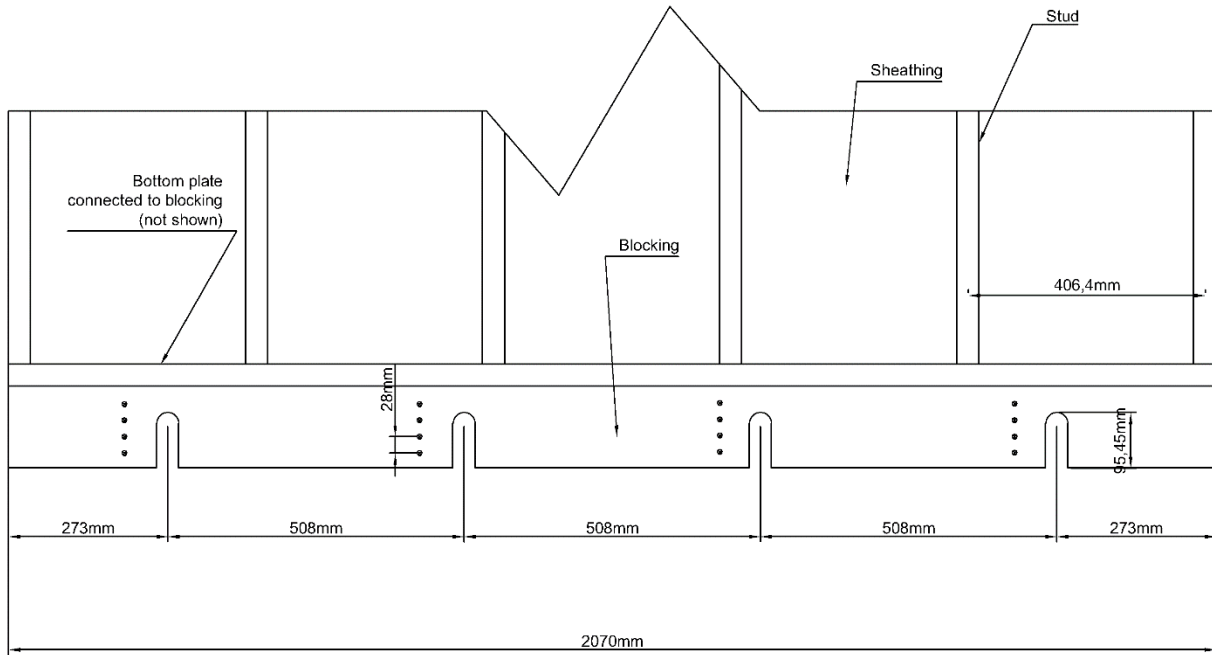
Wall detail for typically and atypically connected walls – front view
